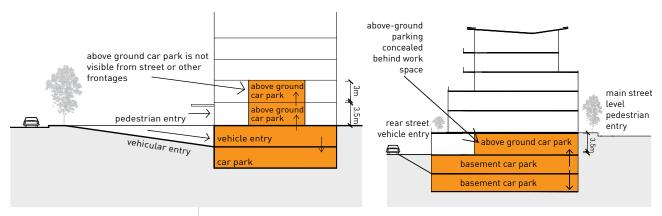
B.2-1: Multi-storey above ground car park is housed within the building to facilitate active street frontages.
